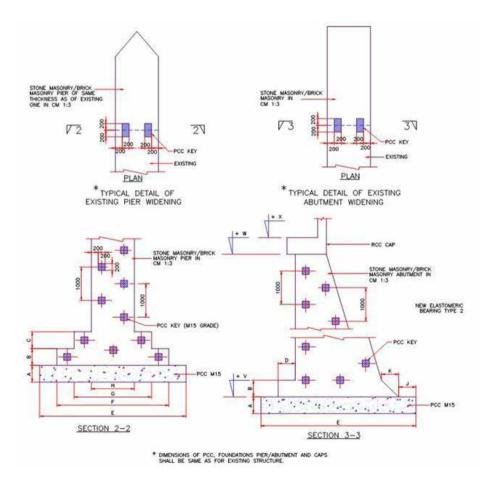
WIDENING OF MASONARY PIER & ABUTMENT USING SHEAR KEYS
